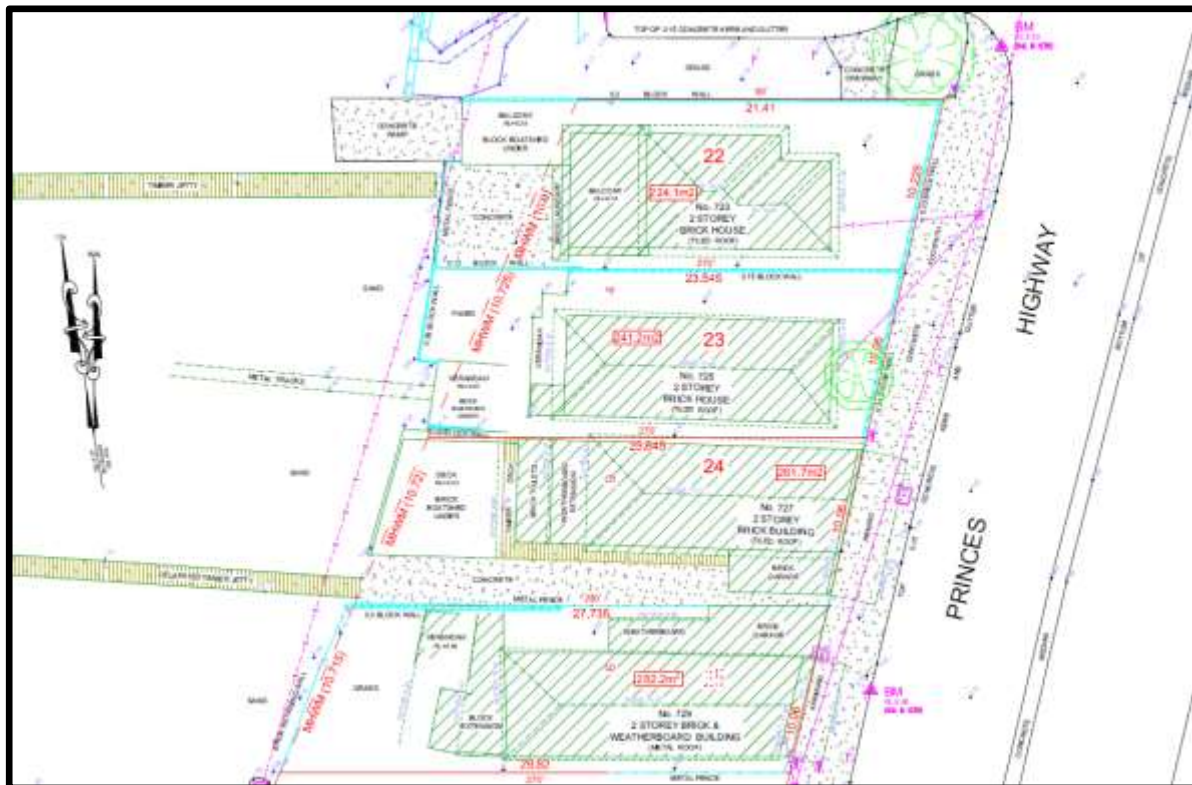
Extract of the survey plan showing the subject site (courtesy: *Daw and Walton Surveyors*)
